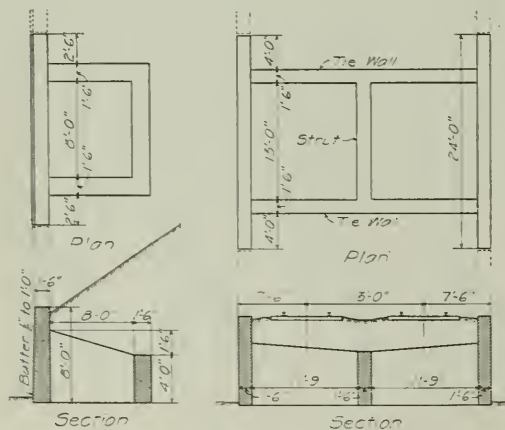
Unsymmetrical and Symmetrical Cellular Retaining Walls
